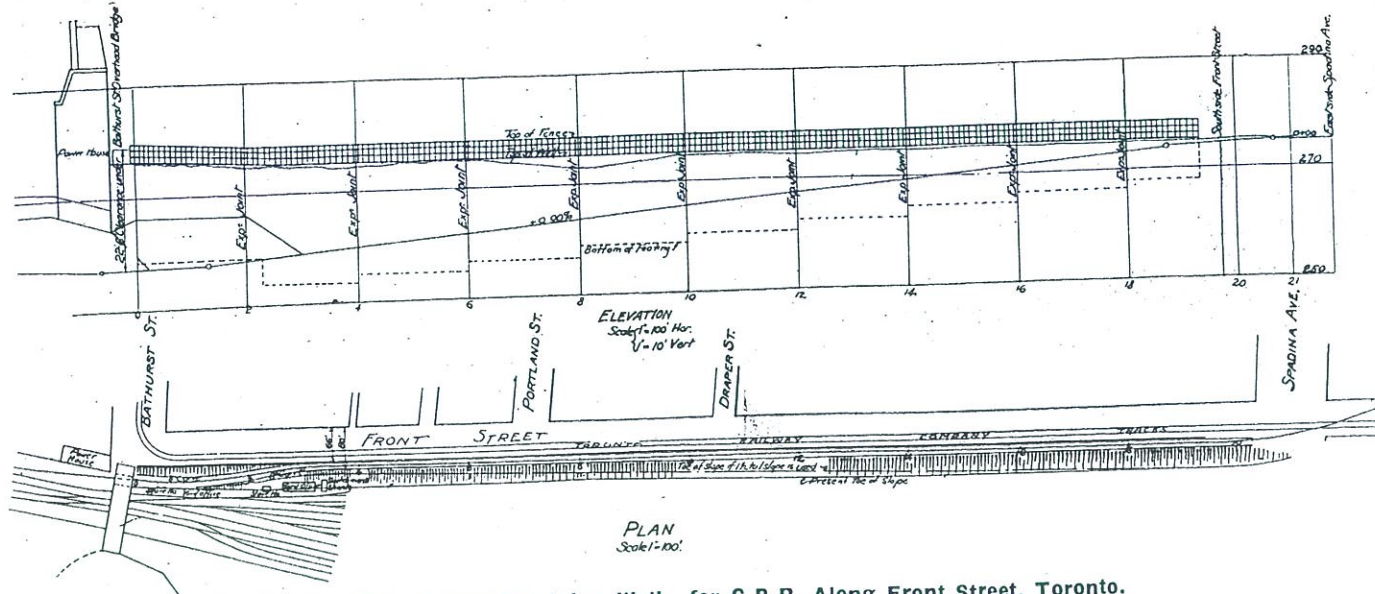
Location of New Retaining Wall for C.P.R. Along Front Street, Toronto.
